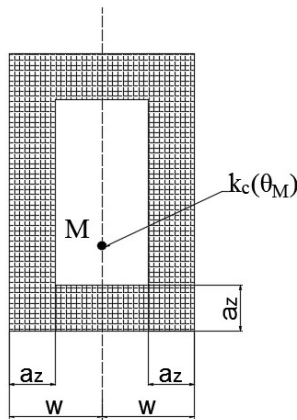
Reduction of strength and cross-section for sections exposed to fire
